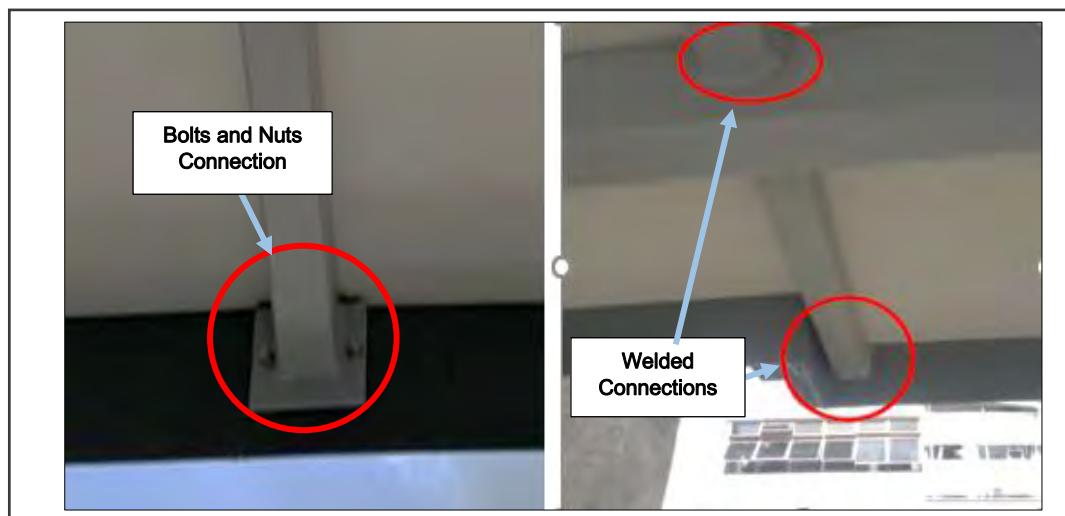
Bolts and Nuts Connections are Preferred, and Welded Connections are Not Recommended
